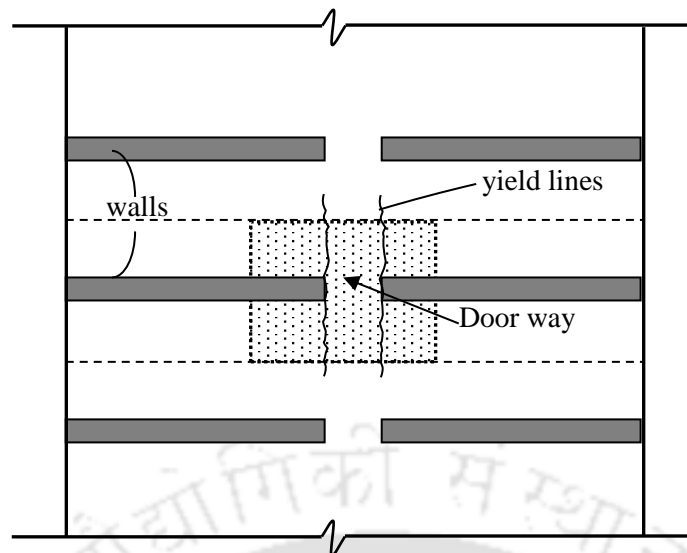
Observation of cracks in the plan view of a typical slab-wall coupling system (Paulay and Taylor, 1981).
